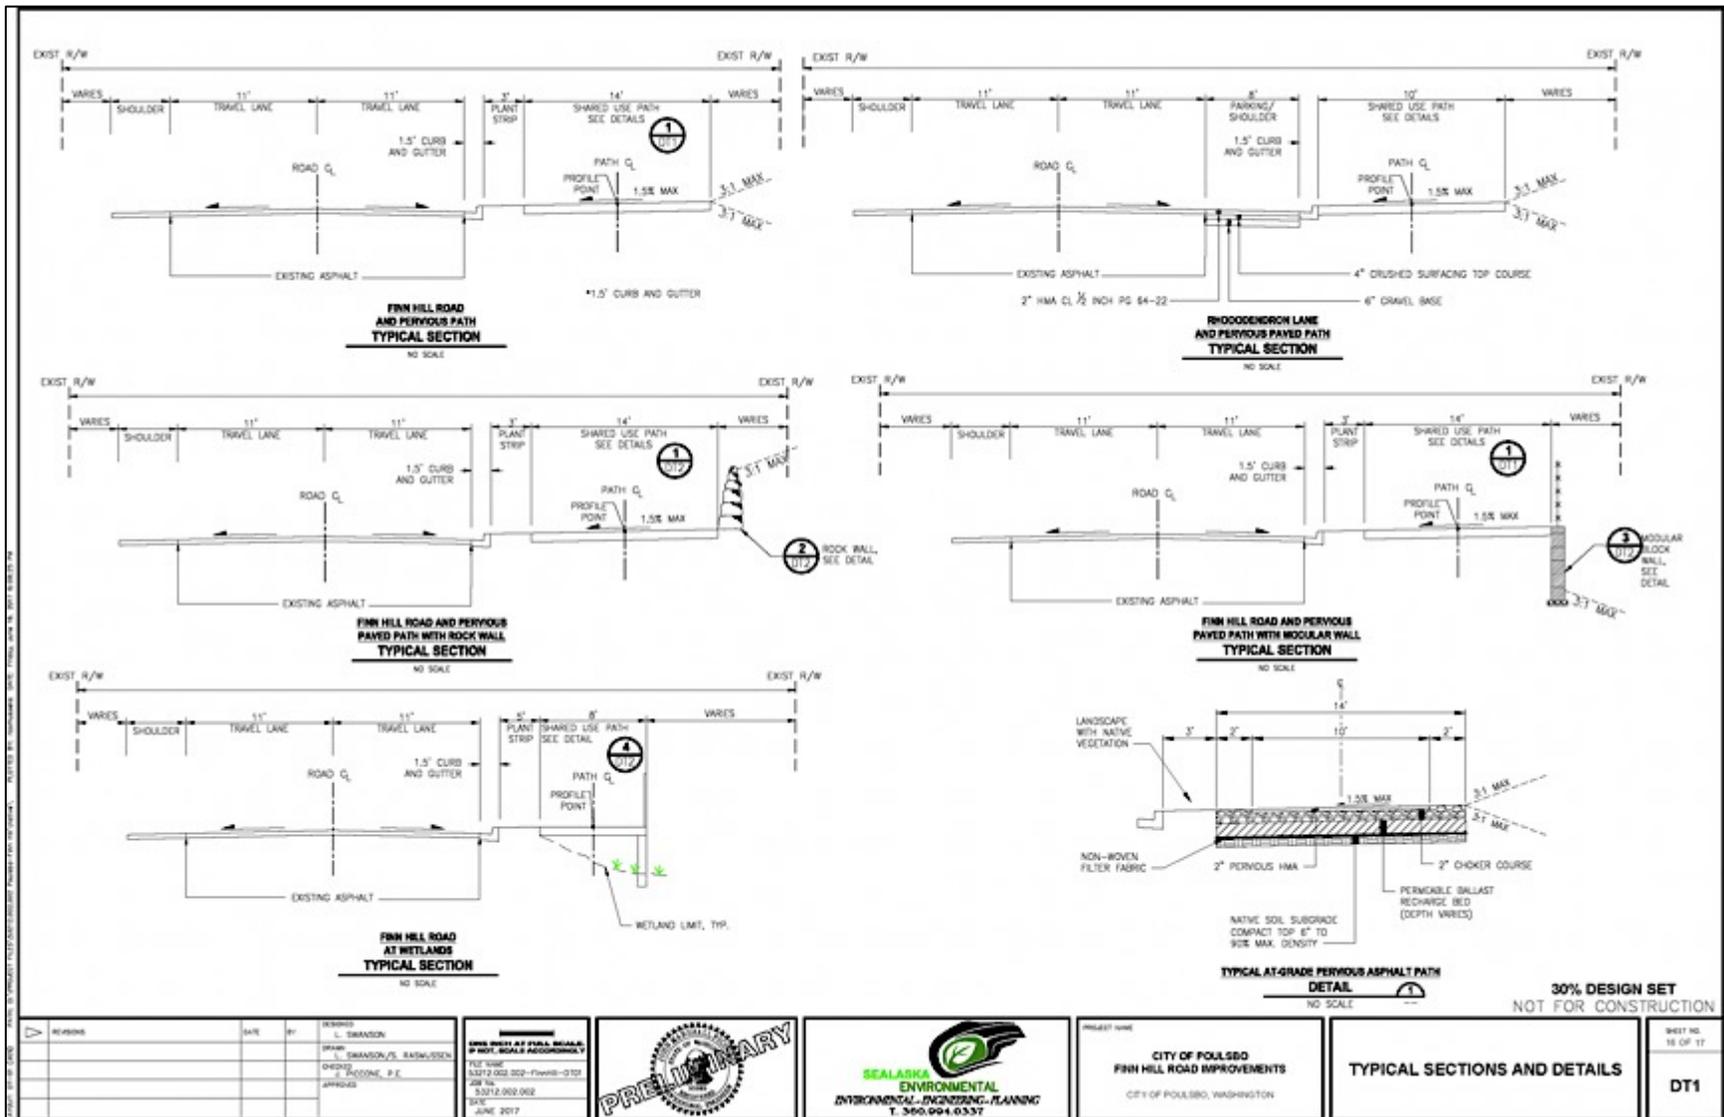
Excerpt from plans showing typical proposed cross-sections, provided by City of Poulsbo.
